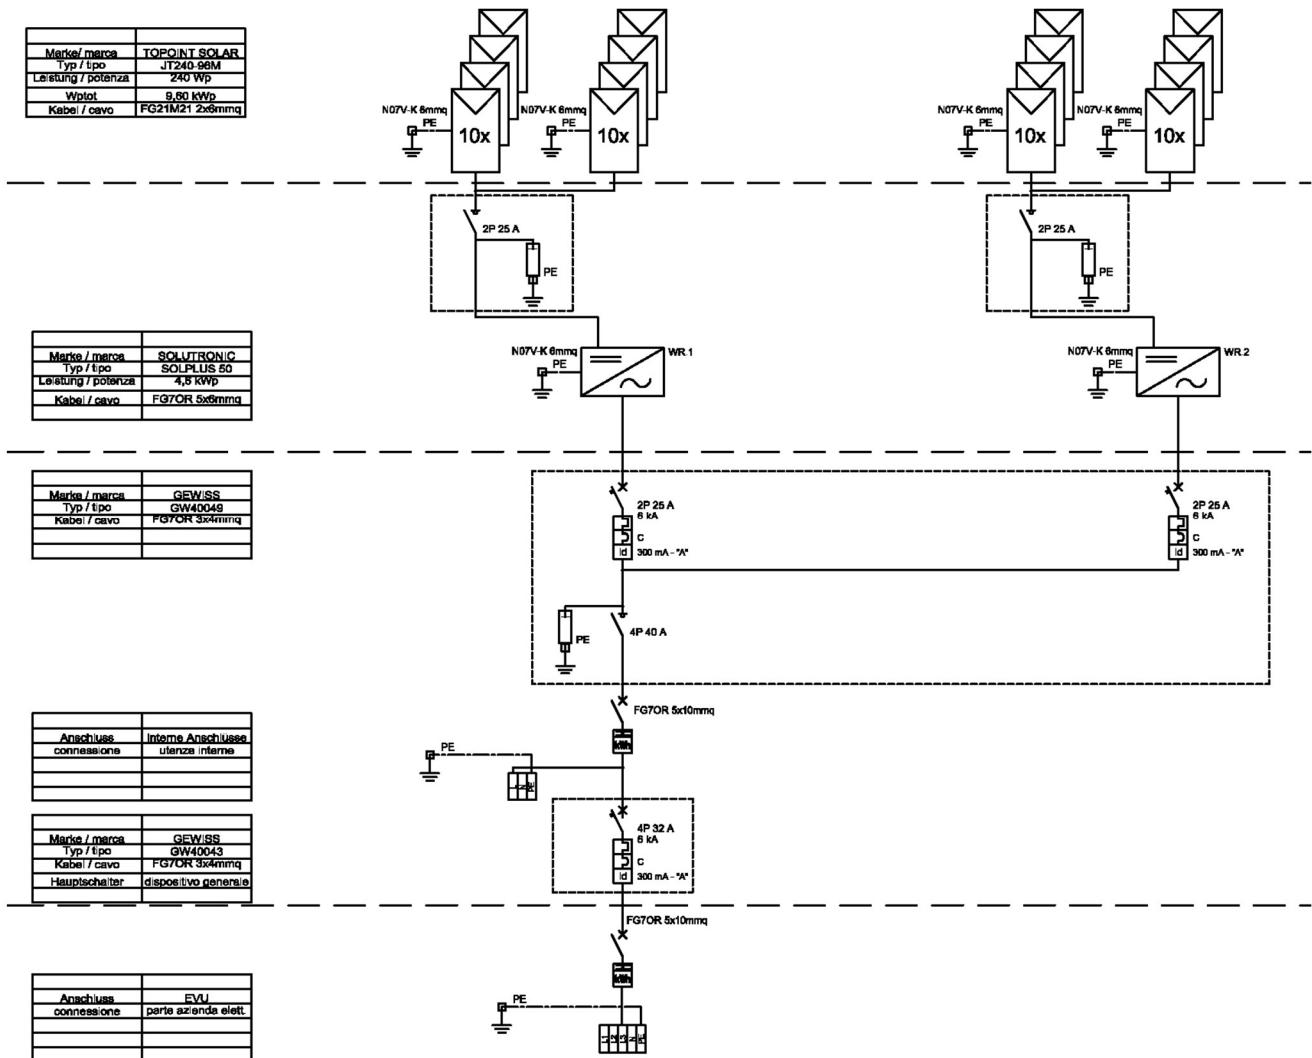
Wiring diagram of the PV roof plant (Bolzano test site)
